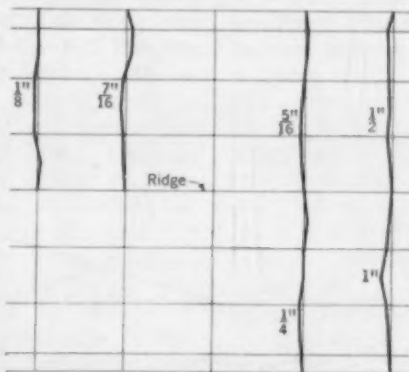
PLAN VIEW SHOWING LATERAL DEFLECTIONS OF TRUSSES, UPPER CHORDS
